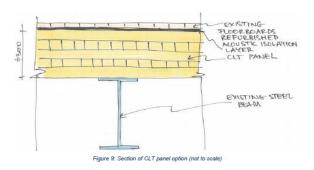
Mass timber flooring on existing steel beams—structural detail option 3. (Source: Floor Options Study, Taylor Thomson Whitting Pty Ltd, 2018)
